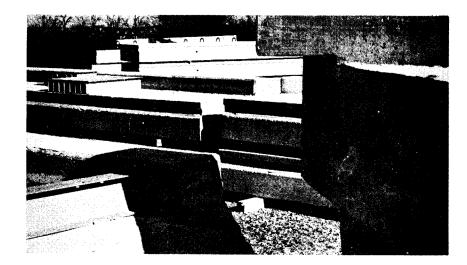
Exterior beam with curb cast in slab. Guardrail and post are attached in field.
